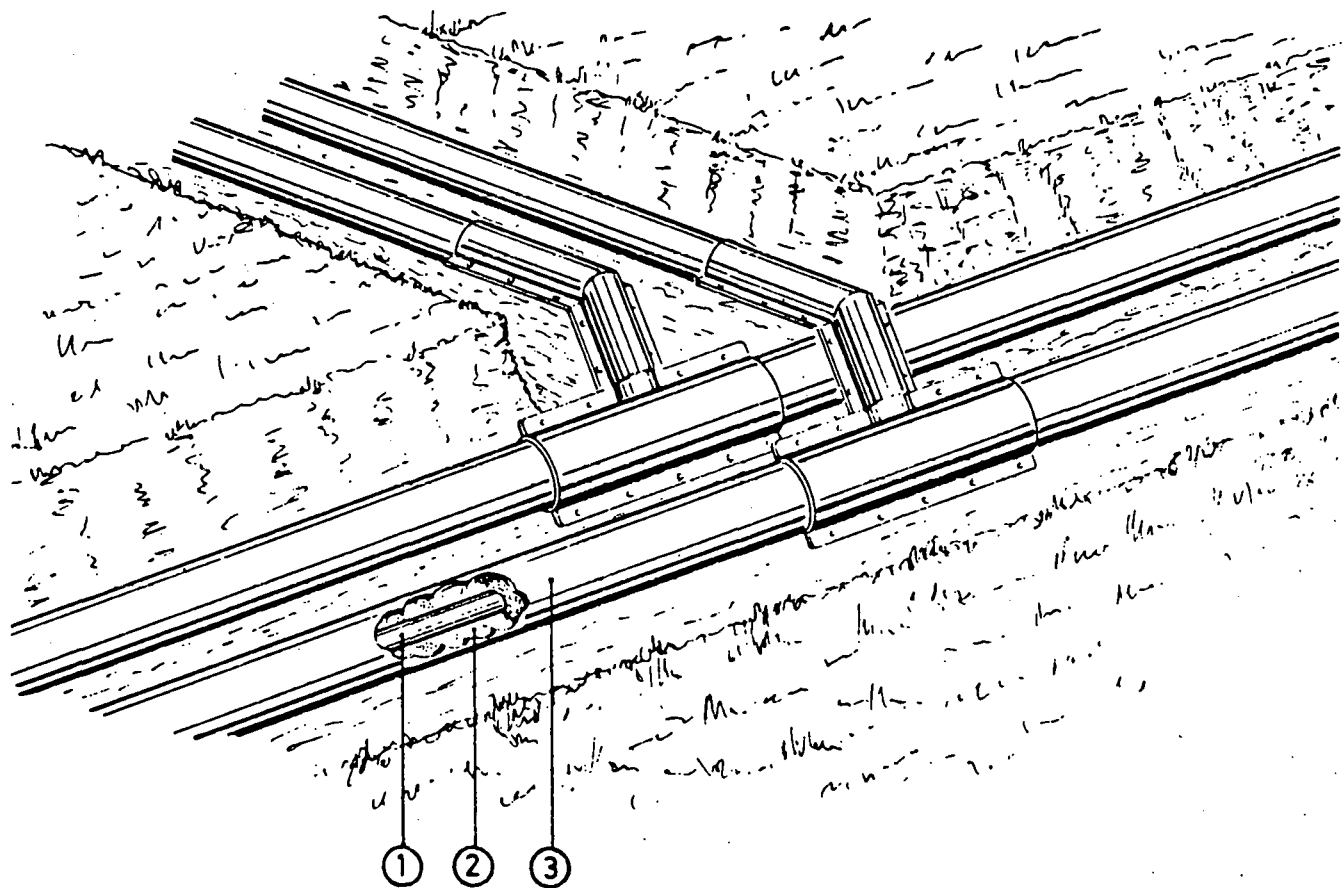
TYPICAL PREFABRICATED CONDUIT
